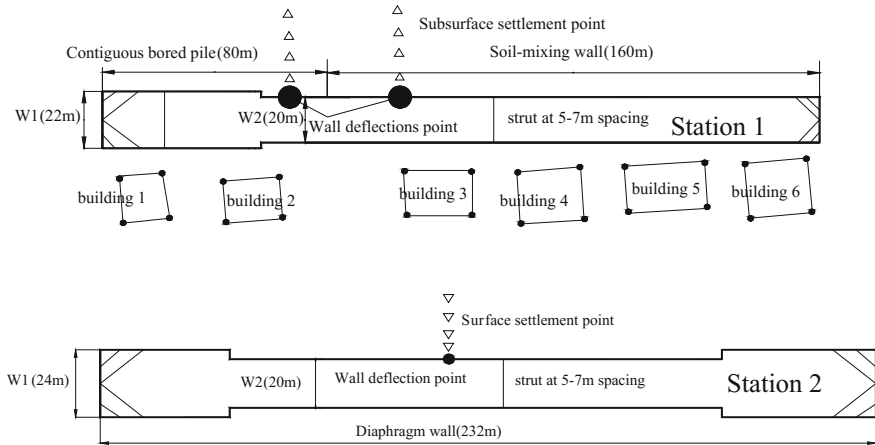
Plan view showing a typical station and arrangement of strutting system
